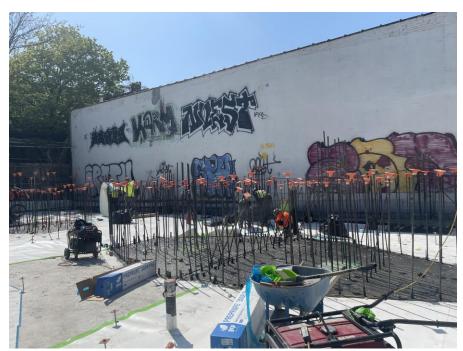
Kingdom installing the waterproofing/vapor barrier membrane in the northern part of Sackett Place (facing southwest)
